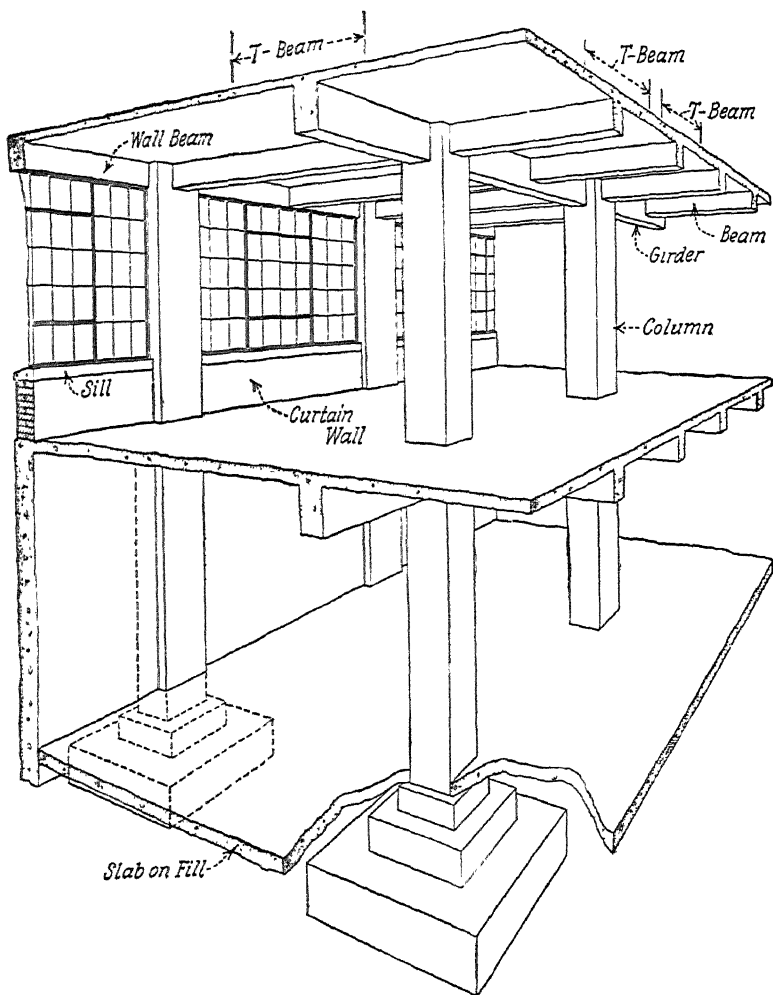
Perspective View of Beam and Girder Skeleton.<sup>1</sup>
